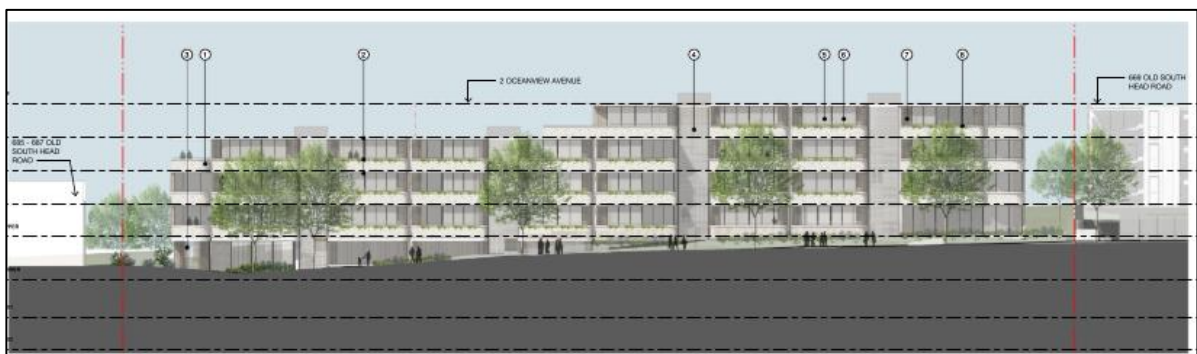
Approved elevation to Old South Head Road for DA-455/2021 also showing the approved elevation for DA-374/2020 for the shop top housing at 669 Old South Head Road which was not part of the site
